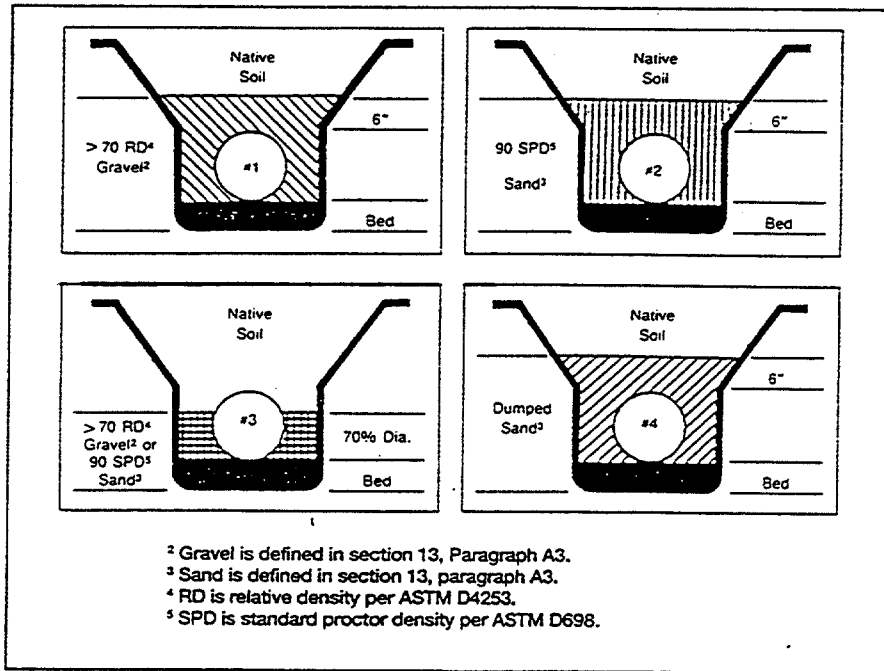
Trench Cross-Sections for Hobas Fiberglass Pipe
